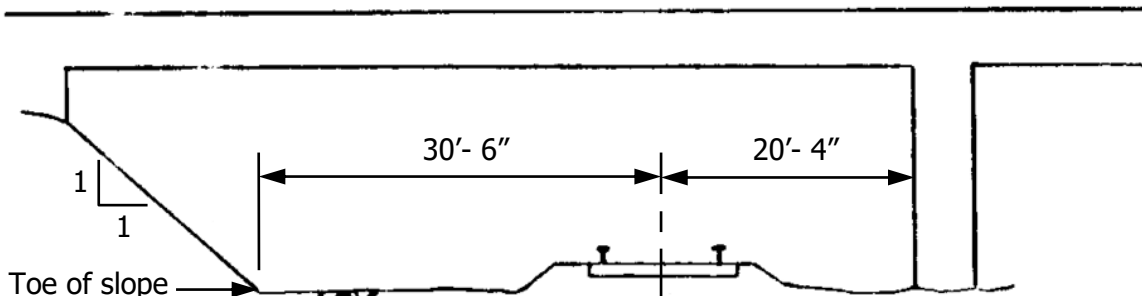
Bridge elevation view with one passenger rail and one freight rail track below the bridge.
